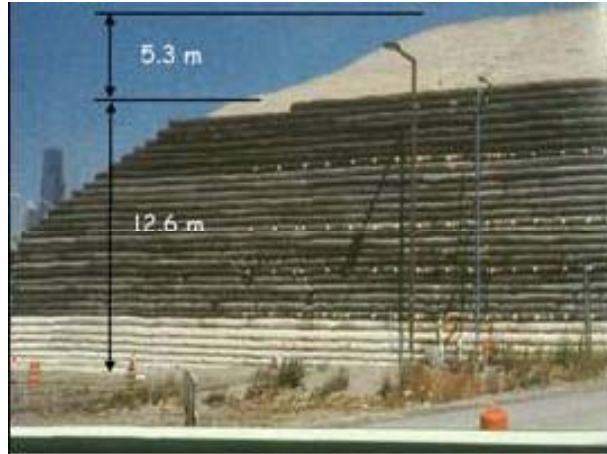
Temporary geotextile wrapped-face wall (Bathurst)
